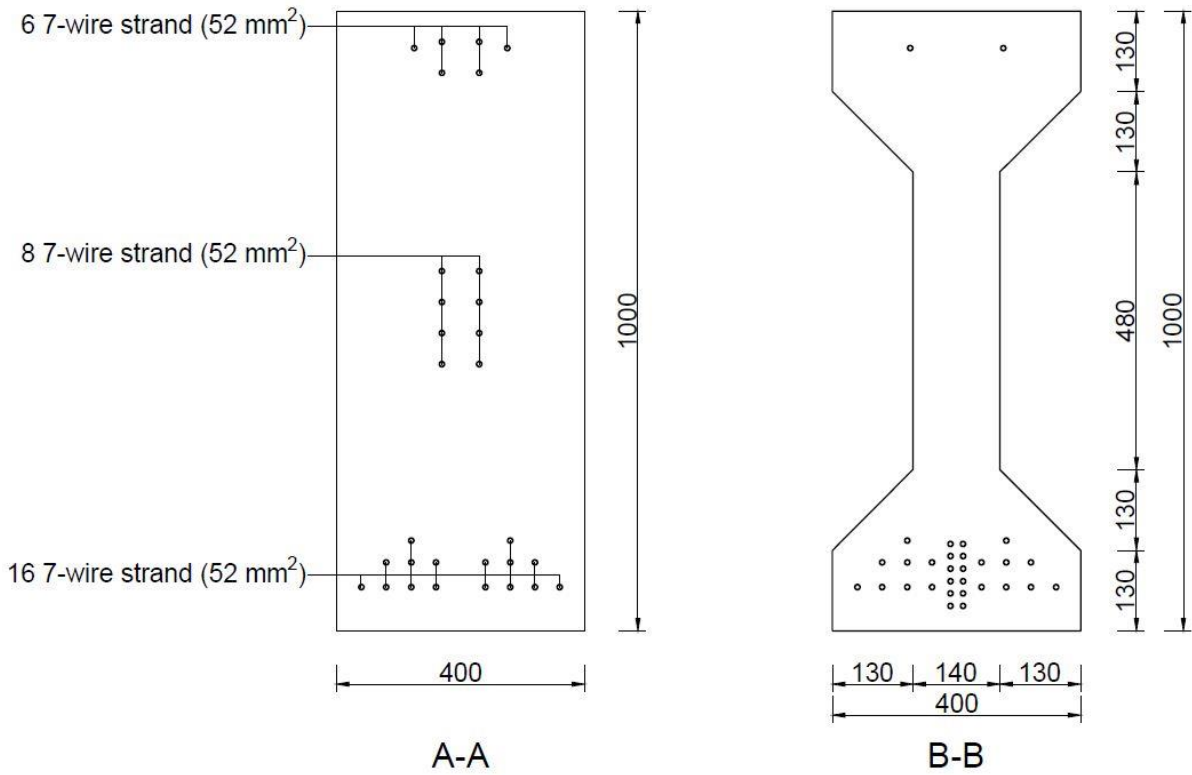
Cross-sections I-girder Nijkerker Bridge
